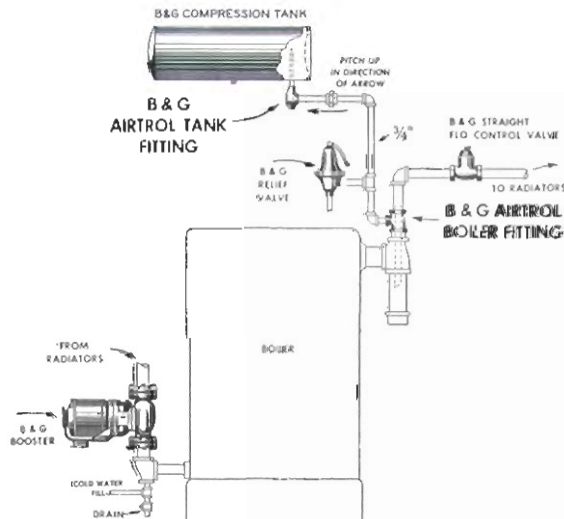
A. B & G Airtrol System installation on boiler with side opening.
